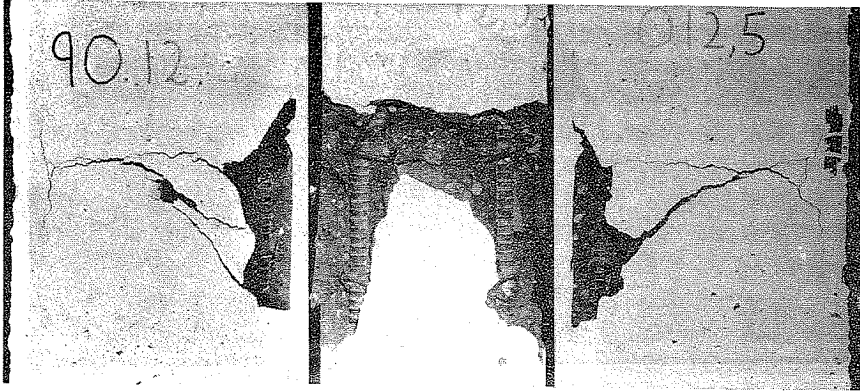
Failure of S.B.-specimen No. 90/12.5.
